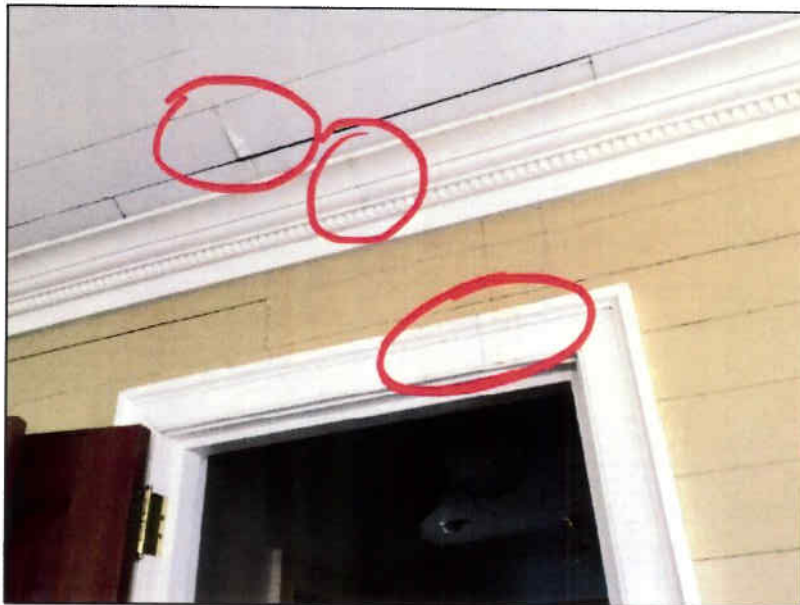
Detail of an Example of Water Infiltration from Room Showing Warped Wood Planks in Ceiling and Staining from Water Dripping. Taken 11/7/2017.
